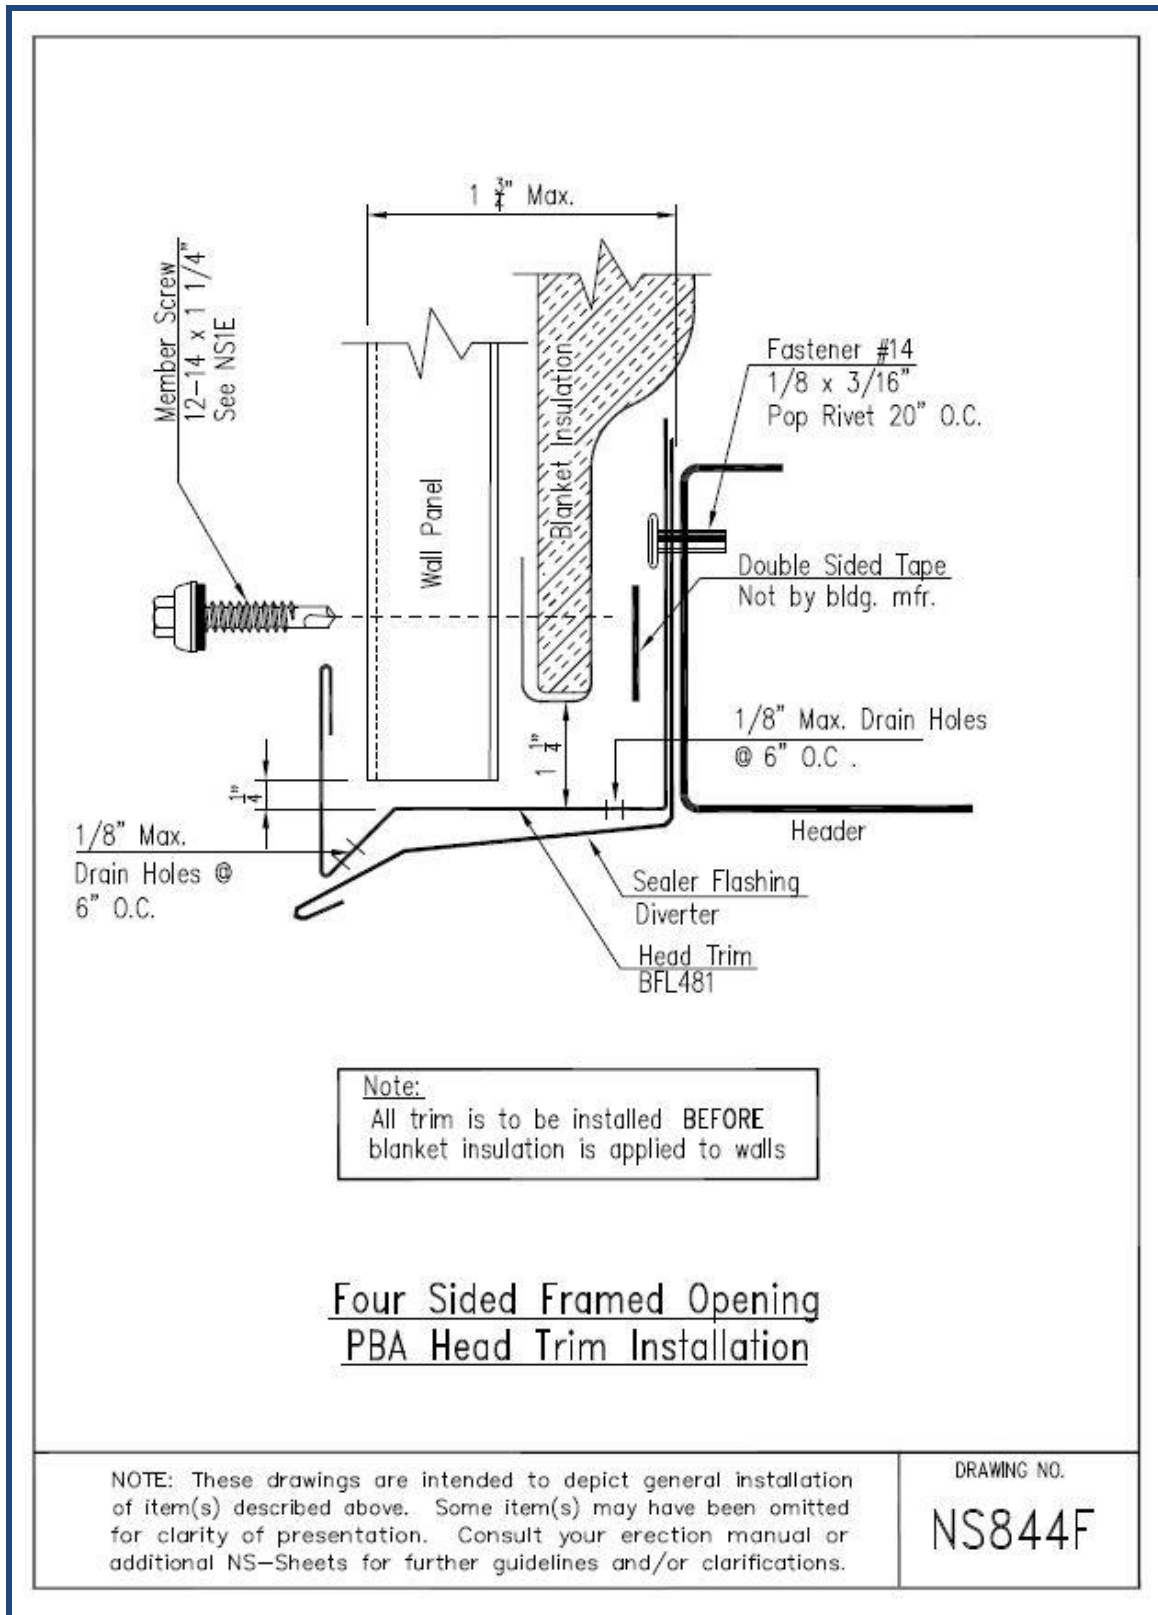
Four Sided Framed Opening Head Trim Installation Detail
